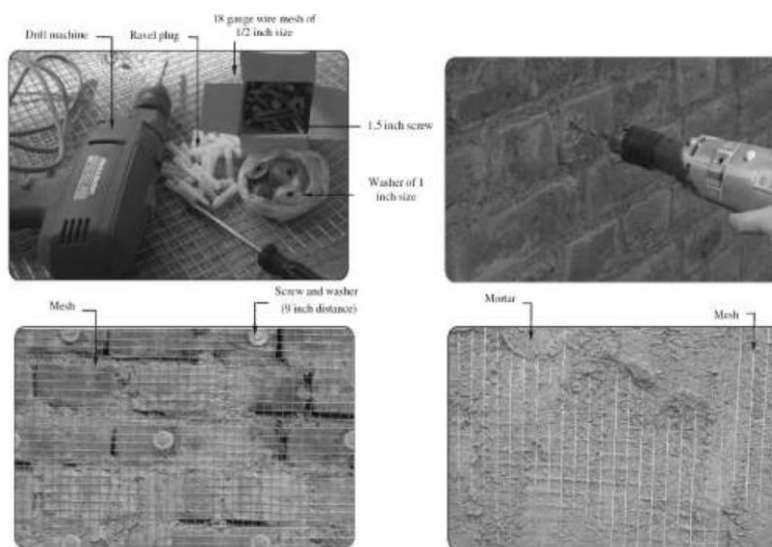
Example of “Ferrocement” Strengthening, but the Wire Mesh was Placed Right Next to the Brick-Wall (Ahmad, et al., 2012)
